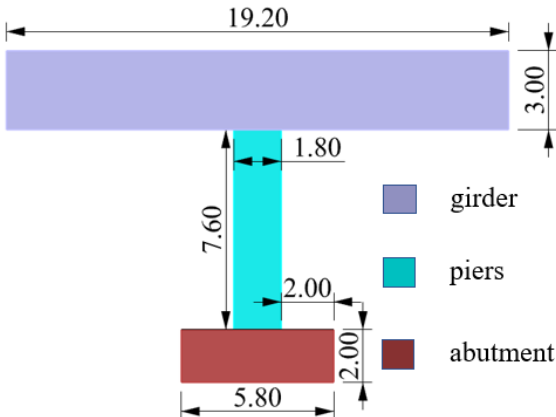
Dimensional detail of specimen B1 (unit: m)
